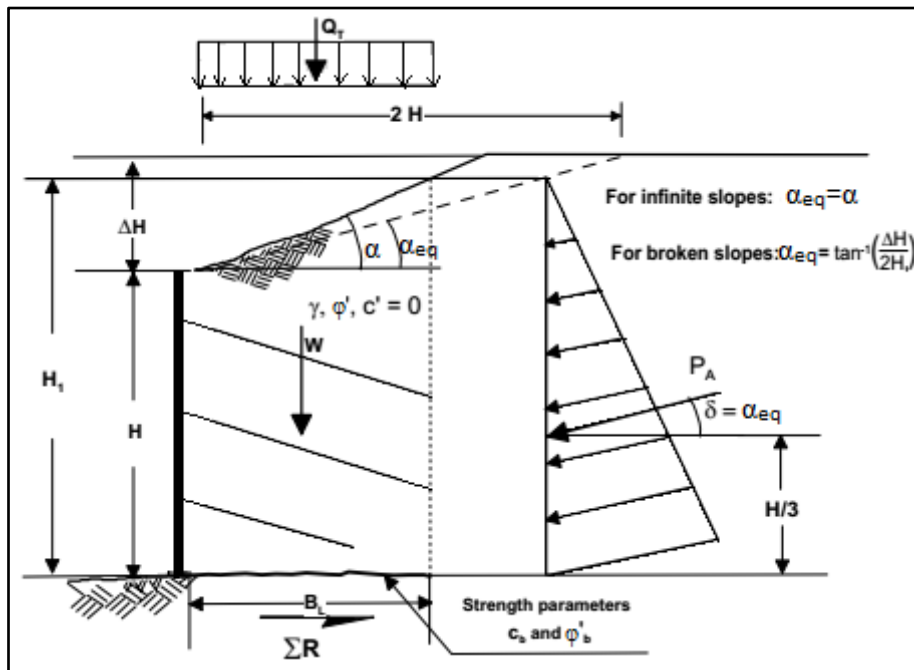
Sliding Stability of Soil Nail Wall Adopted from (Lazarte, 2003)
